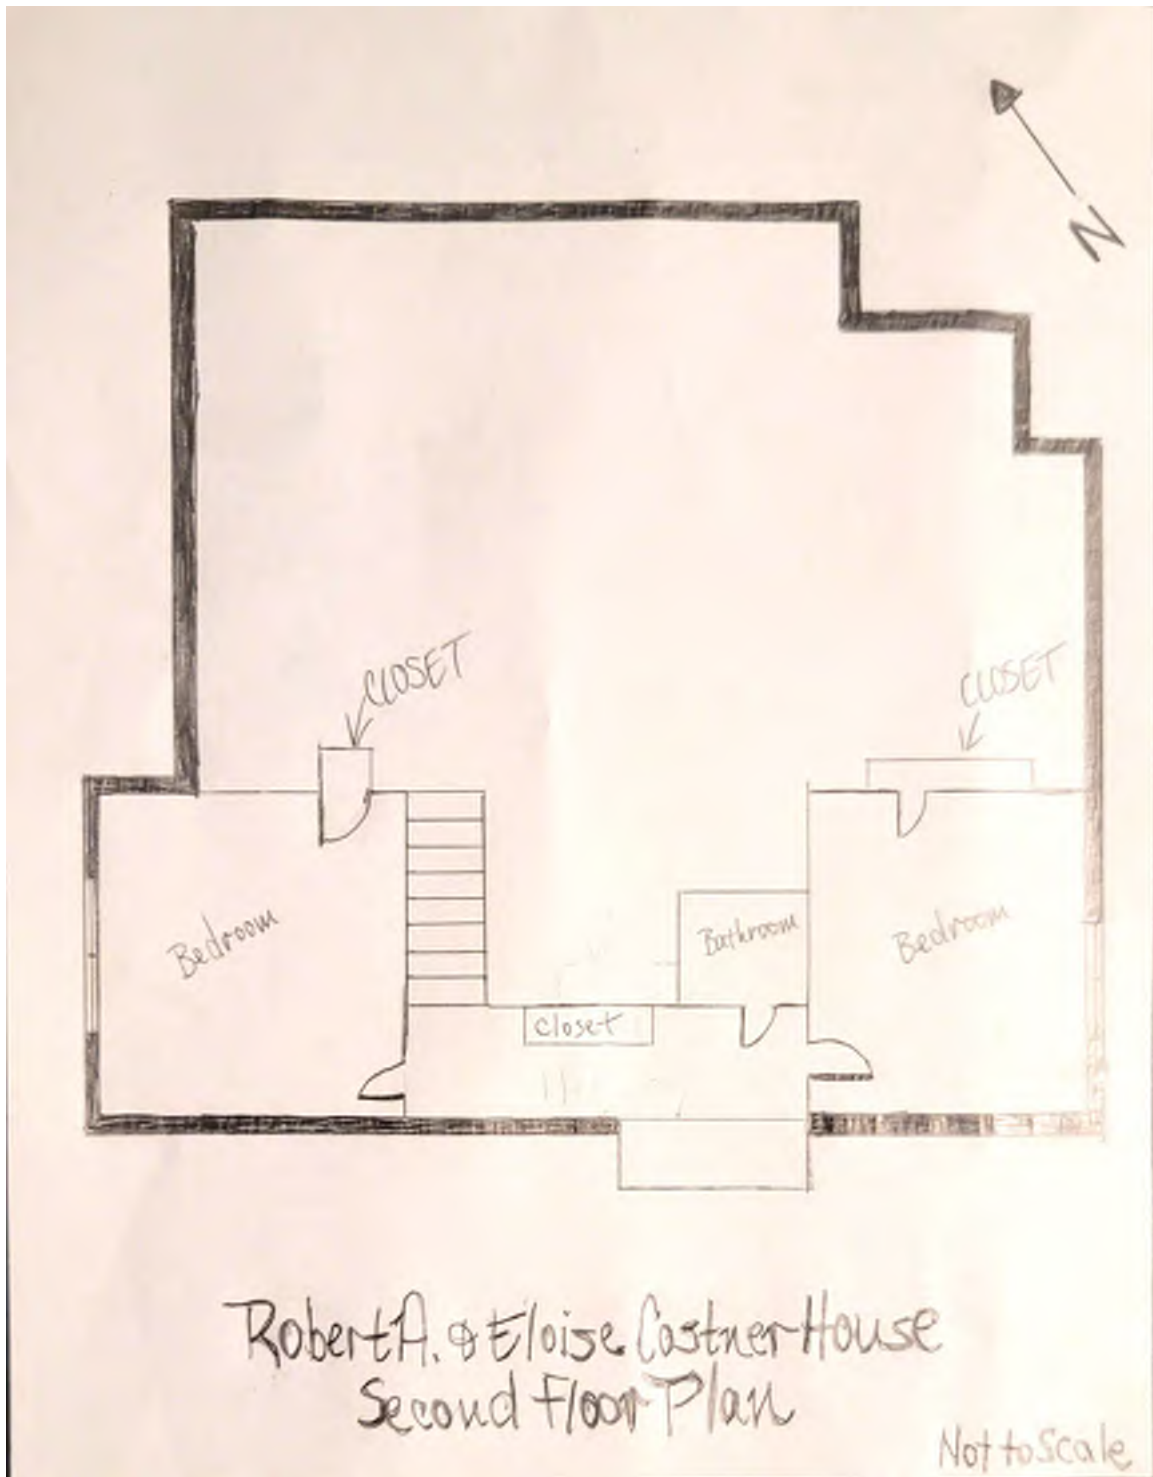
Second Floor Plan, Robert A. and Eloise Costner House
